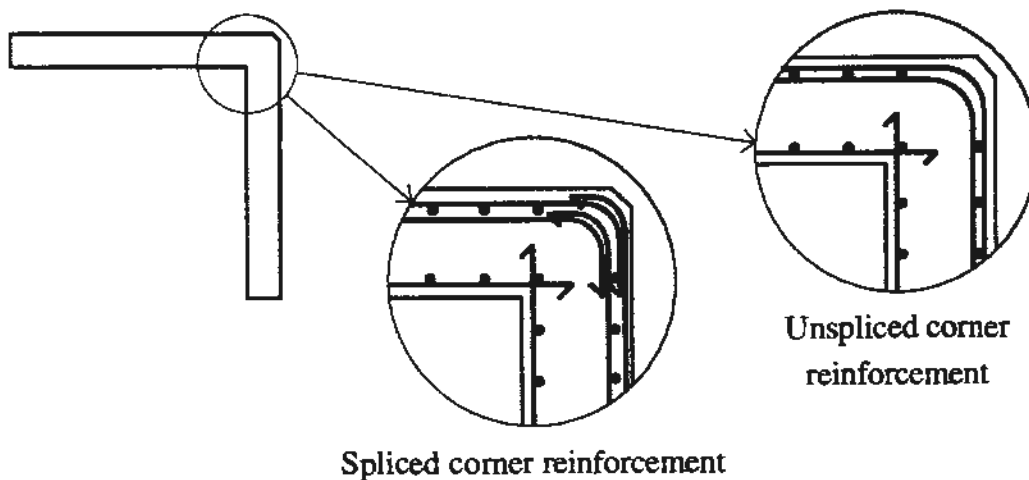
Dimensions and detailing for the last two specimens in the fatigue tests (no. B5 and B6).
